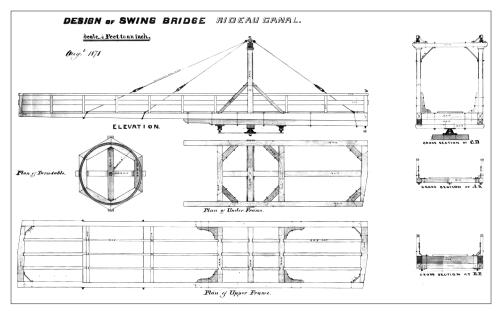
Refined swing bridge design prototype erected at Lower Brewer's in 1872. (PWGSC, Rideau Canal microfiche drawings, R-2.118.2, "Design of Swing Bridge, Rideau Canal," August 1871)
